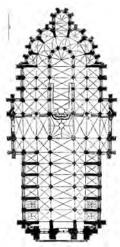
Amiens (France), Cathedral of Notre-Dame, Begun 1220; floor plan.
